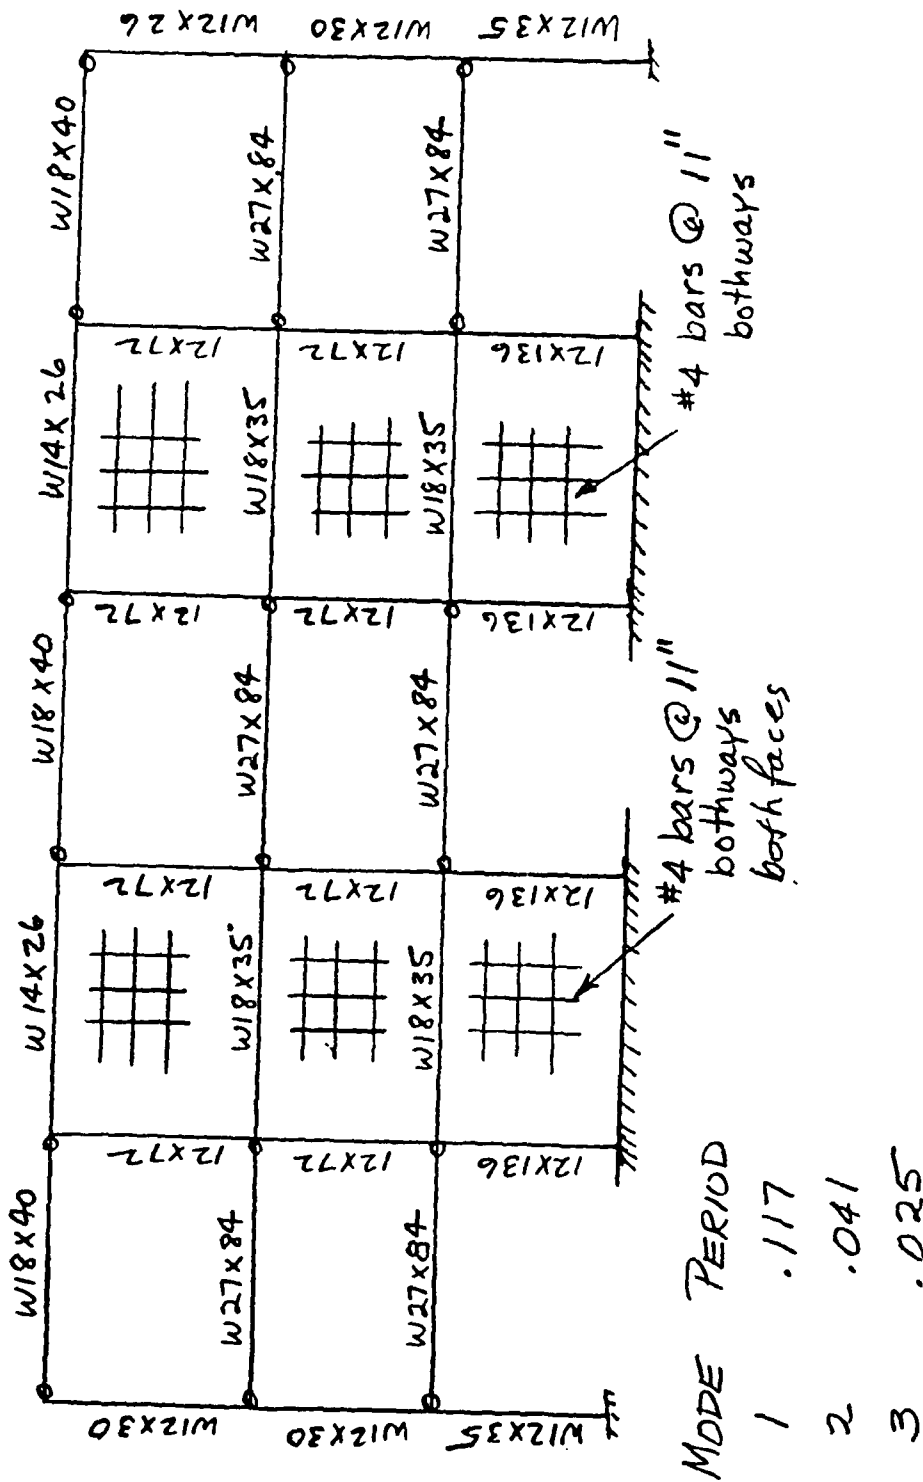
Shear wall frame, 0.35g base acceleration, 14-inch concrete wall.
